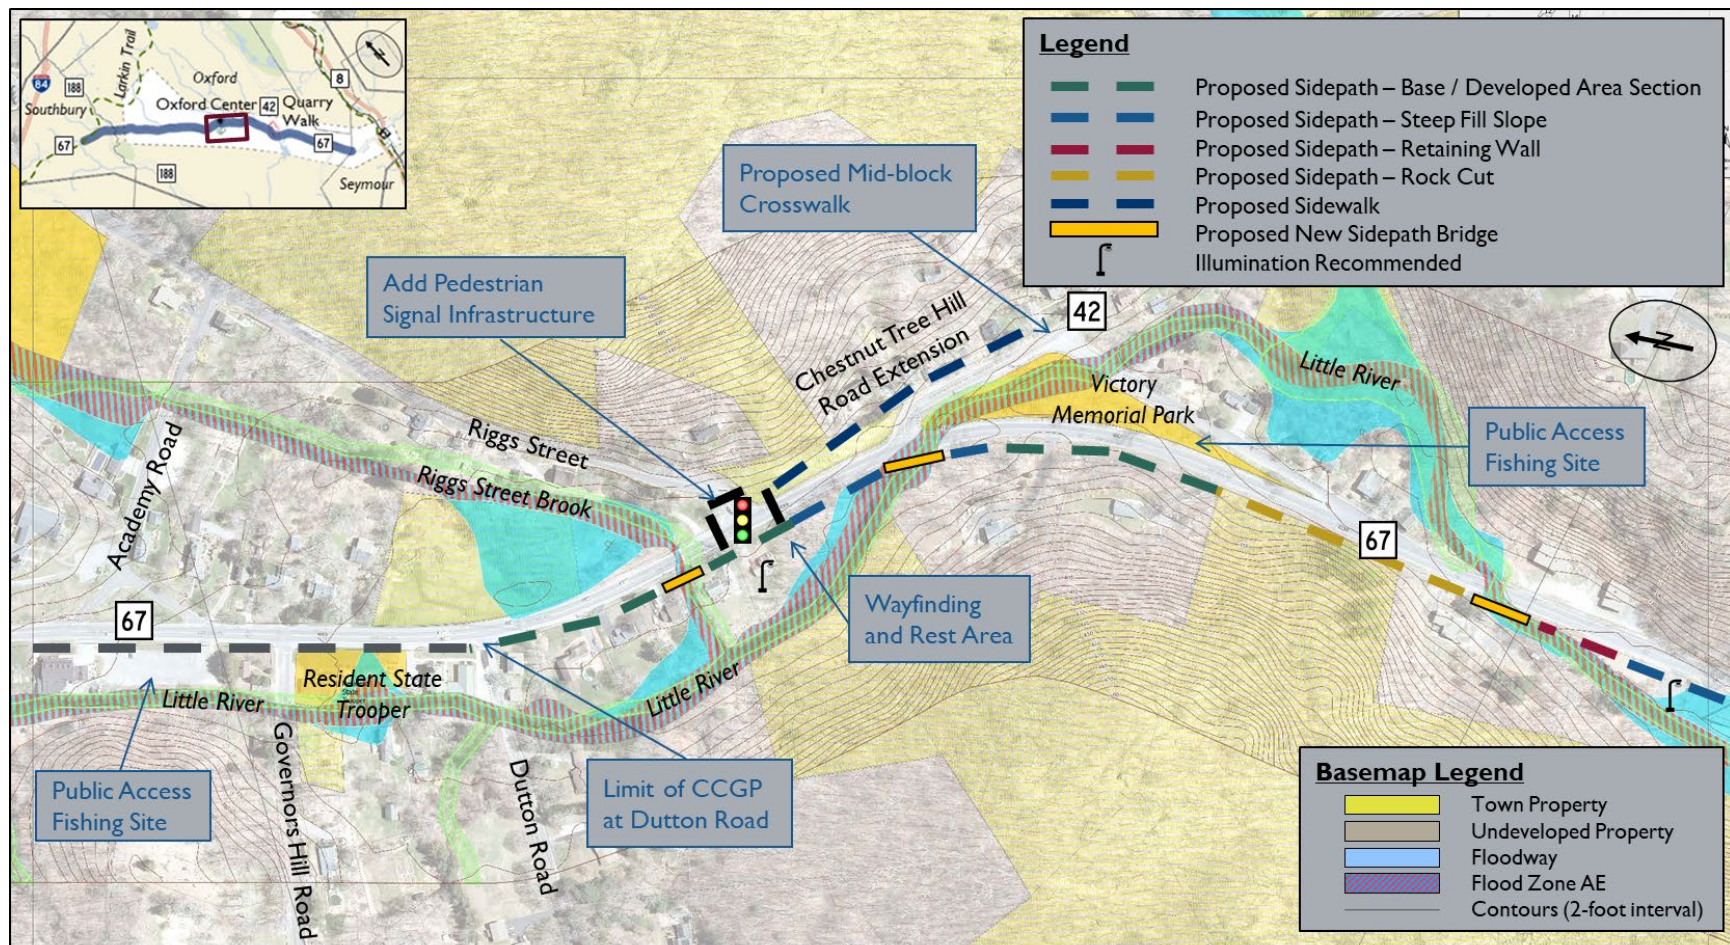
, below presents the subsection between Academy Road and the Route 67 Bridge over the Little River south of Victory Memorial Park. This section is directly south of the previous subsection. The CCGP sidepath project limits are at Dutton Road. The sidepath is recommended to continue along the west side of Route 67 throughout the subsection. This subsection includes several locations where the sidepath would need to cross the Little River or
